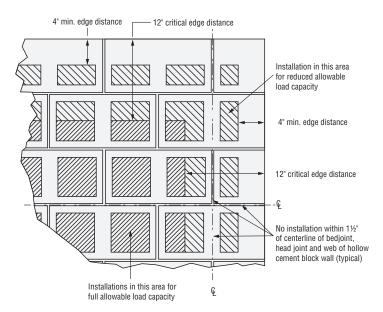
Allowable Anchor Locations for Full and Reduced Load Capacity When Installation Is in the Face of Hollow CMU Masonry Wall Construction
